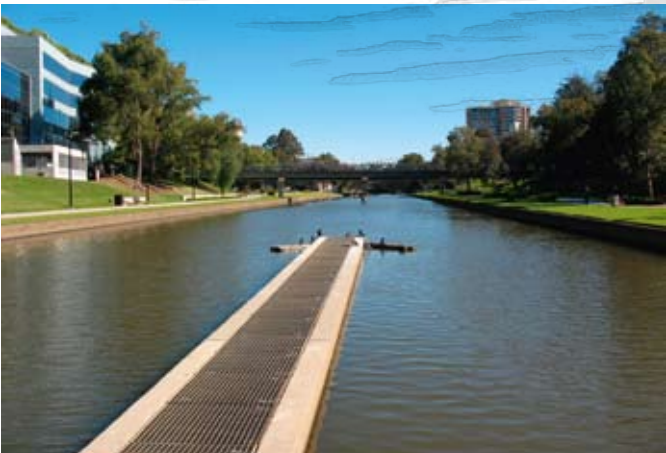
Looking upstream along covered fishway from Charles Street Weir at Parramatta
